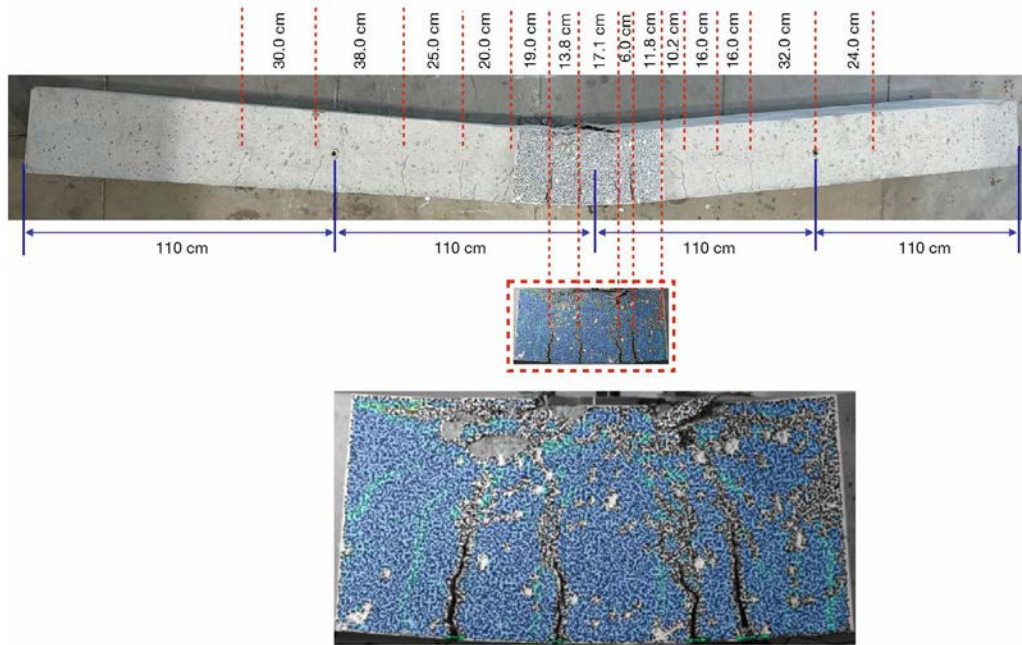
Crack spacing analysis for Beam 2 (Sagging configuration).
